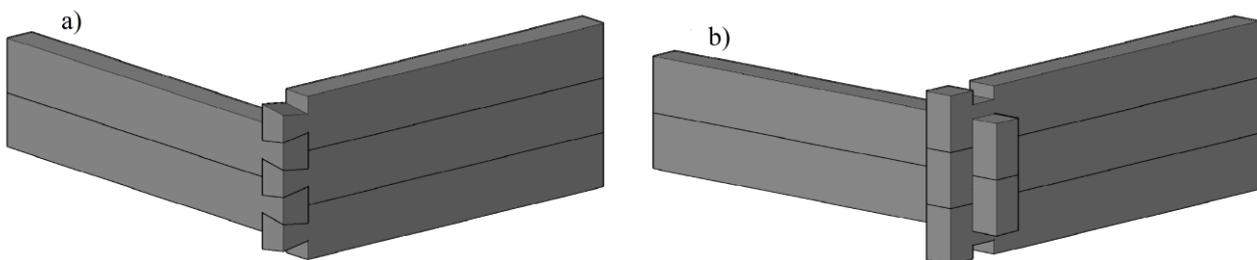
Geometry of carpentry joints: a) short-corner dovetail connection, b) saddle notch corner joint
